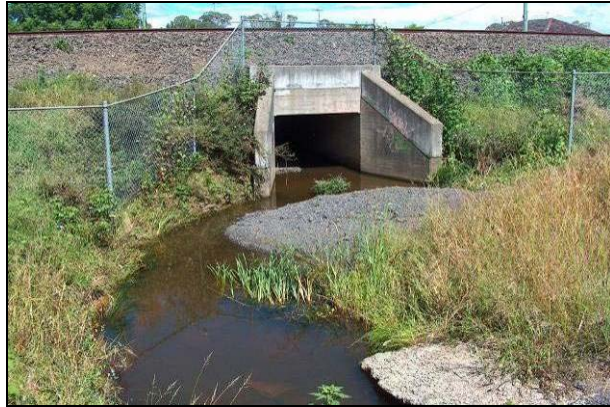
22 Looking west- south- west towards the culvert located north- west of Schofields Station.
